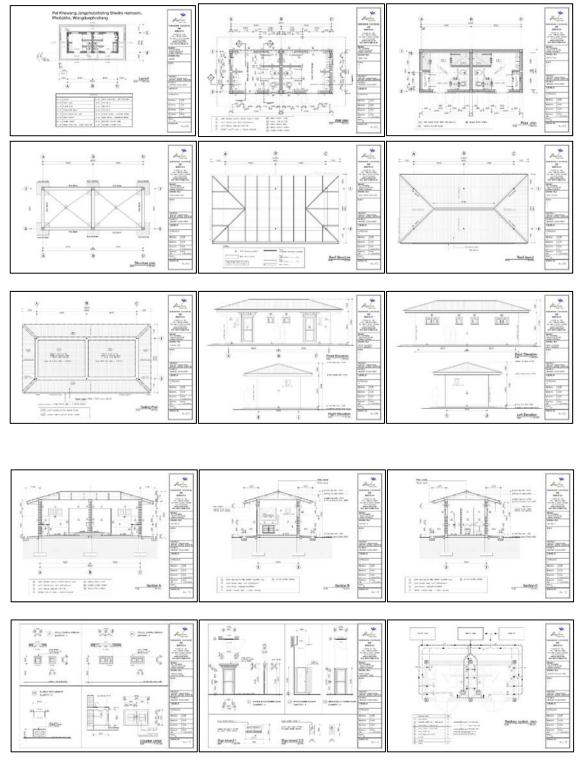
Construction drawings of Pel Khewang Jangchopcholing Shedra restrooms.
